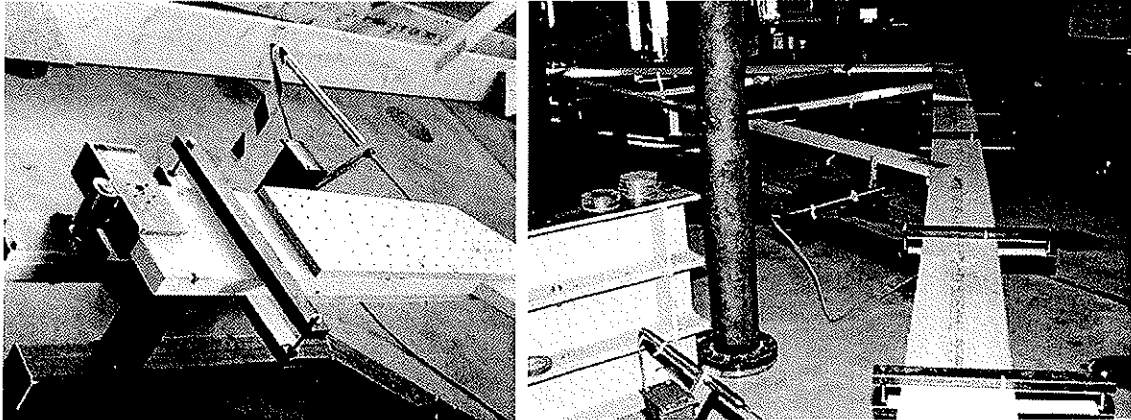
Support of the truss and arrangement to prevent the truss from distortion and buckling out of plane.
